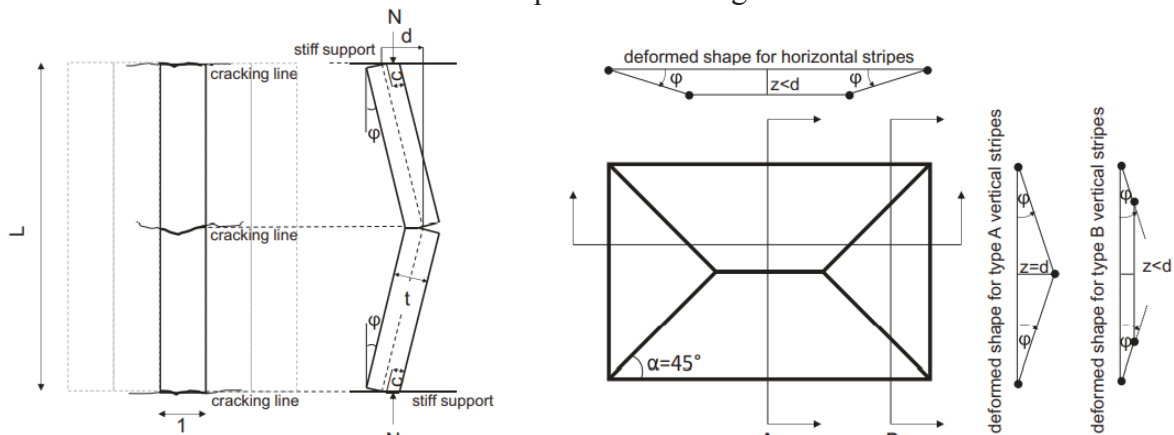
Crack pattern of two – sided (left) and four – sided (right) masonry infill walls subjected to out-of-plane loading [19,21]
